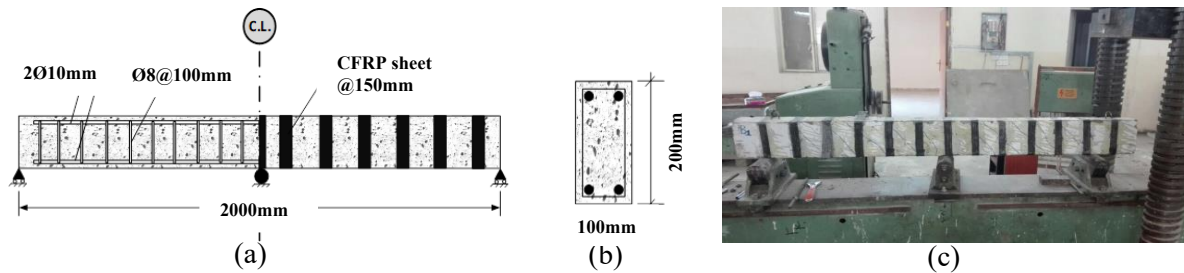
(a) The reinforcement layout and scheme CFRP that used in the study (b) RC beams depth dimensions, (c) The shape of the tested samples with CFRP sheets under torsion.[7]
